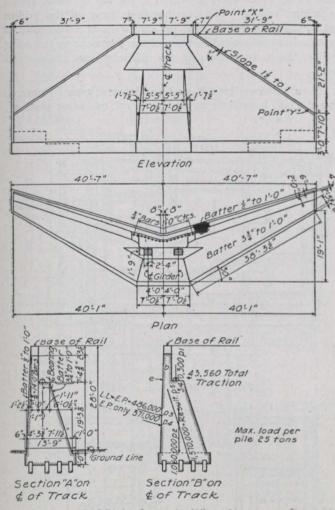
Type B.; Plain Concrete Wing Abutment with Reinforced Backwall.
